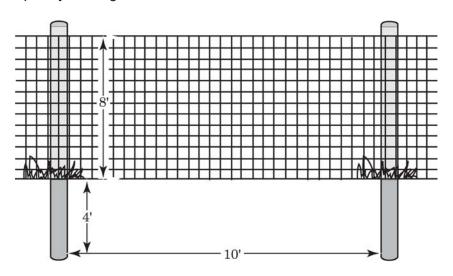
Deer and elk proof fence suitable for protecting stackyards, gardens and orchards. Sink posts 4' deep and space them 10'apart.
